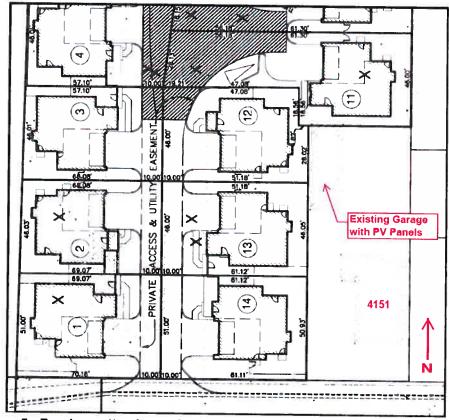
Previous site plan with accessory structure at 4151 Stanley Boulevard
